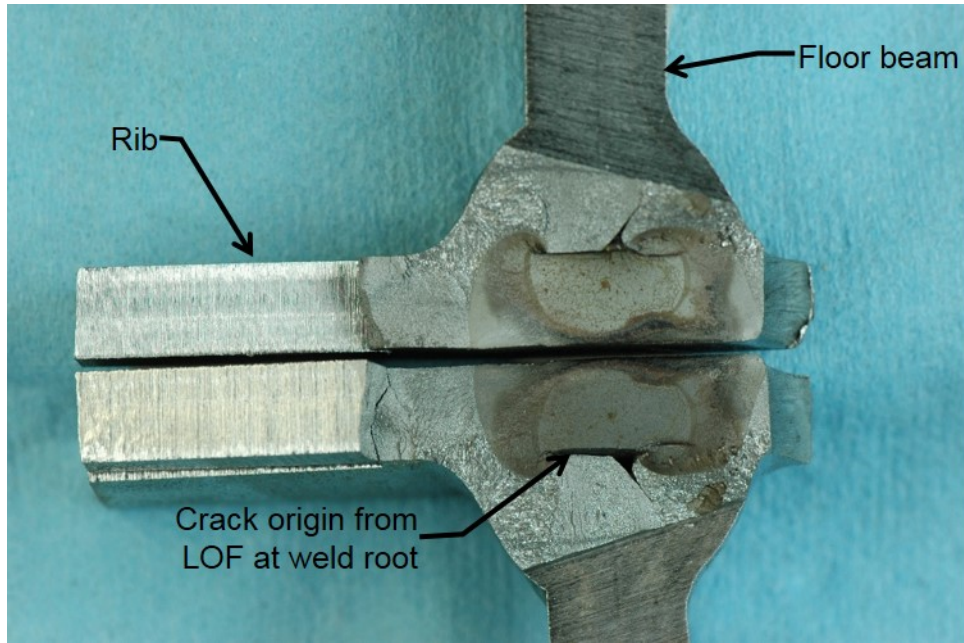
Mating fatigue fracture surfaces for the crack to the south of rib at 27 degrees from rib soffit in MU3
